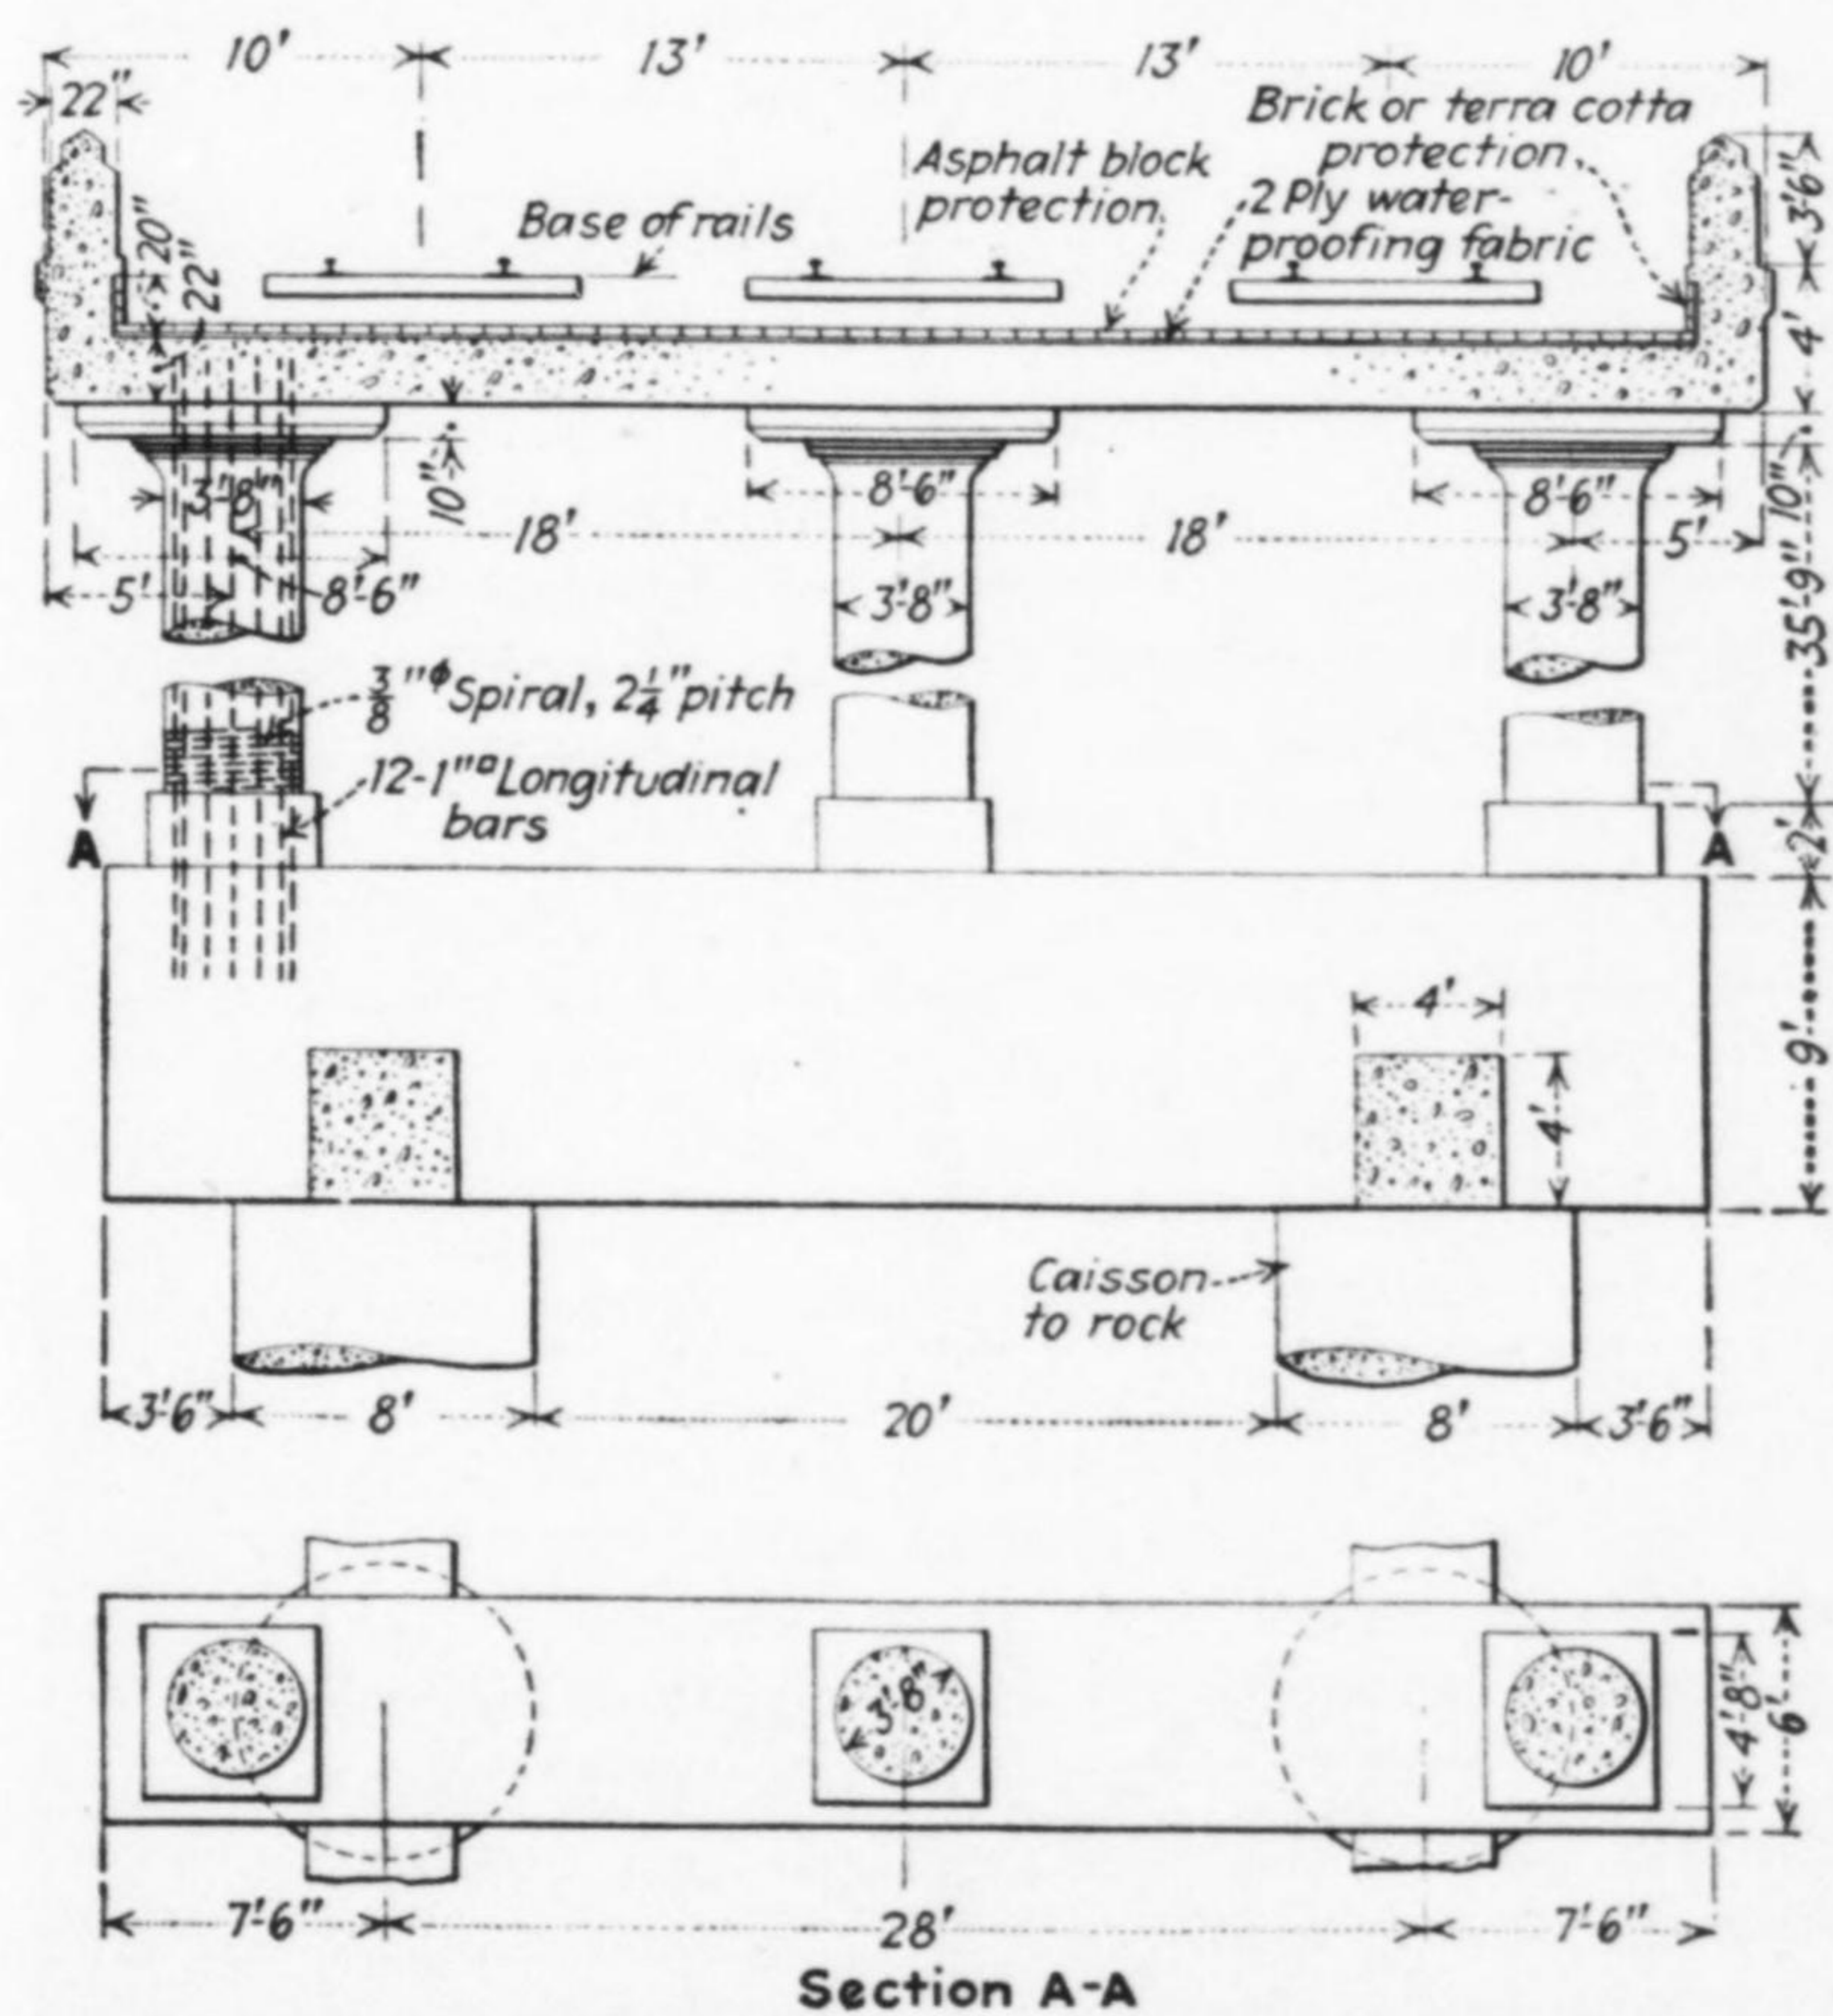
DETAIL SECTION OF EXTREME WEST END FLAT SLAB
